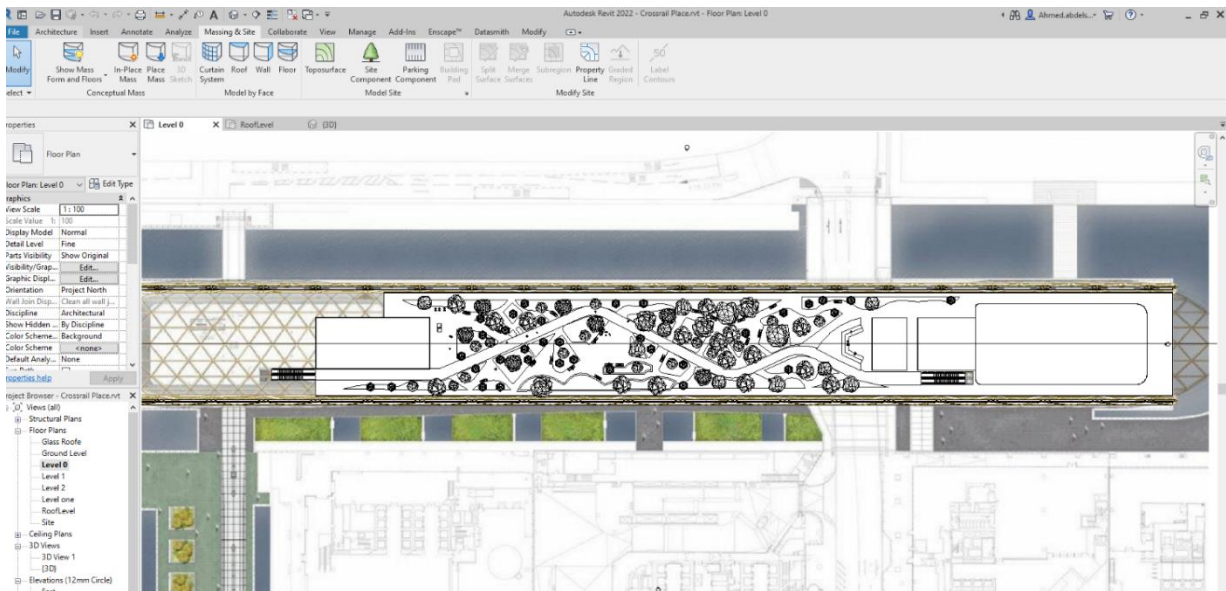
Crossrail Place roof garden project, Autodesk Revit, source: author's model.
